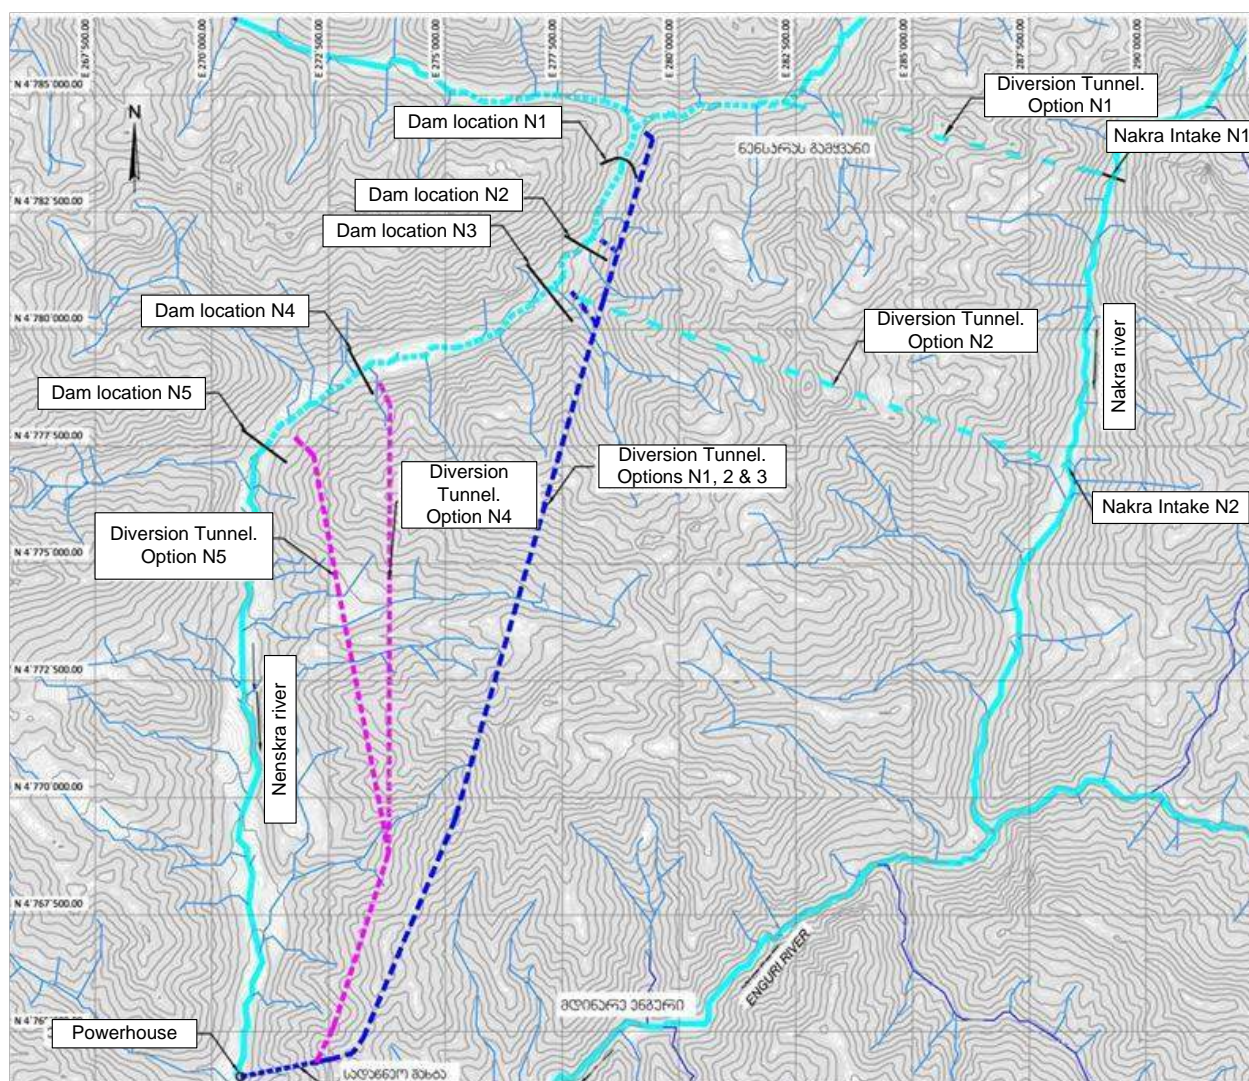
Schematic plan of dam locations (m 1:150 000)
